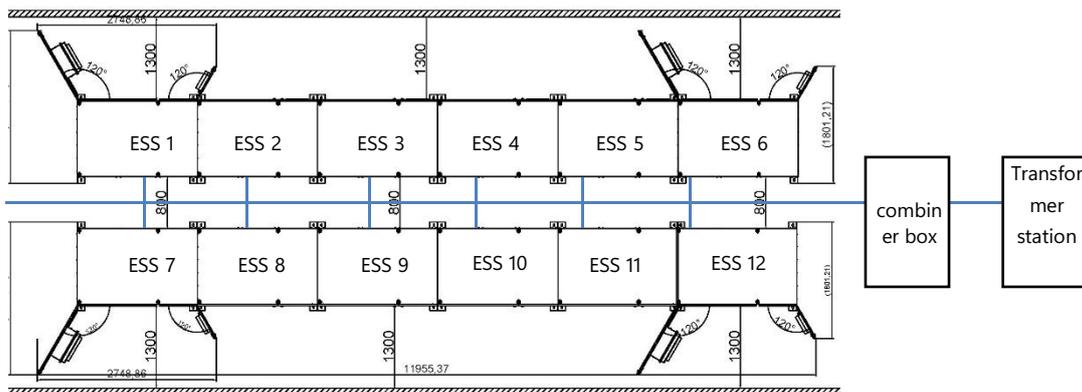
BESS parallel installation space requirements (on-grid scheme)
